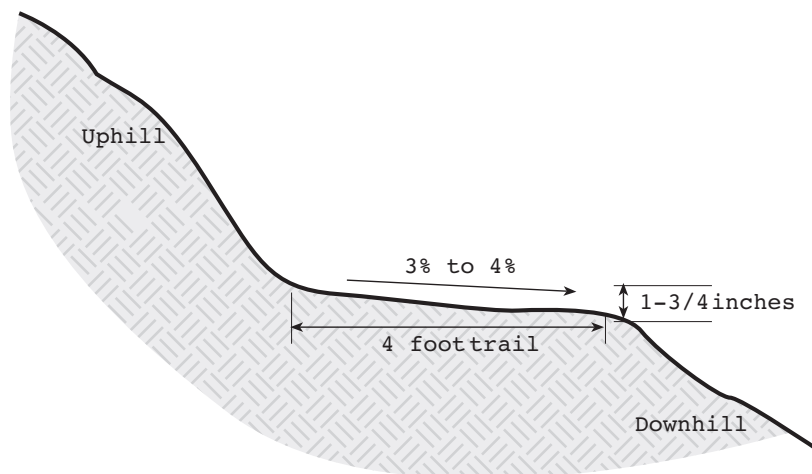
Outslope cross section. (Adapted from California State Parks and Recreation)
